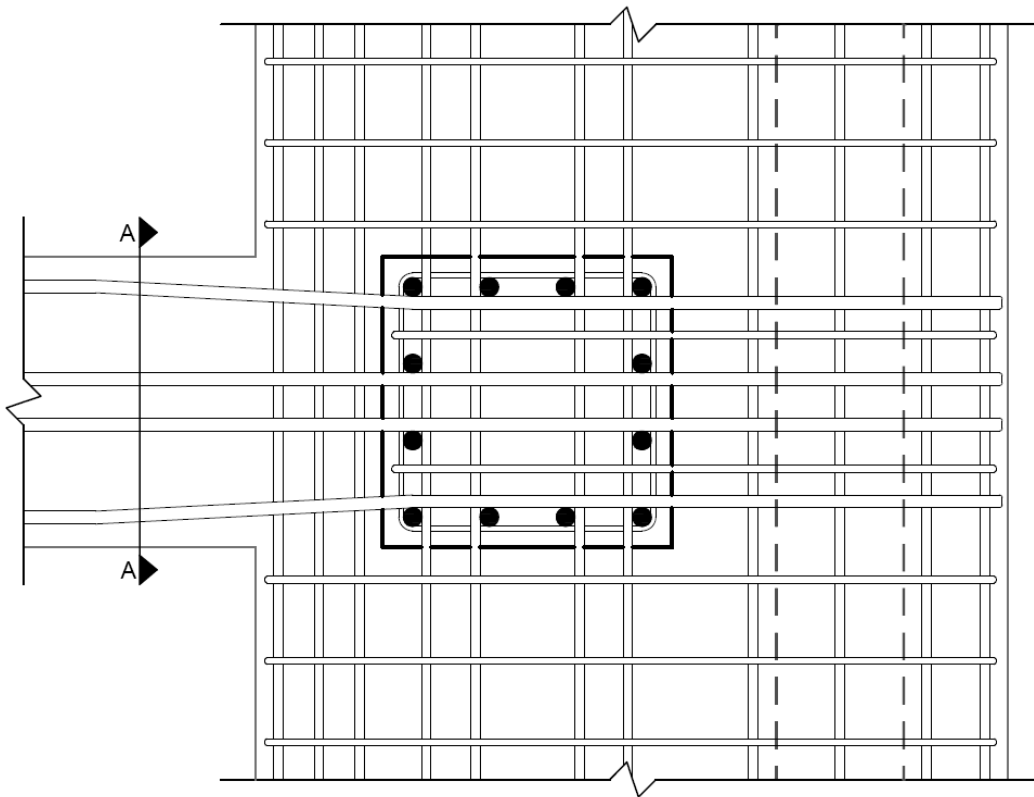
Typical Exterior Girder Section at Joist Joints
